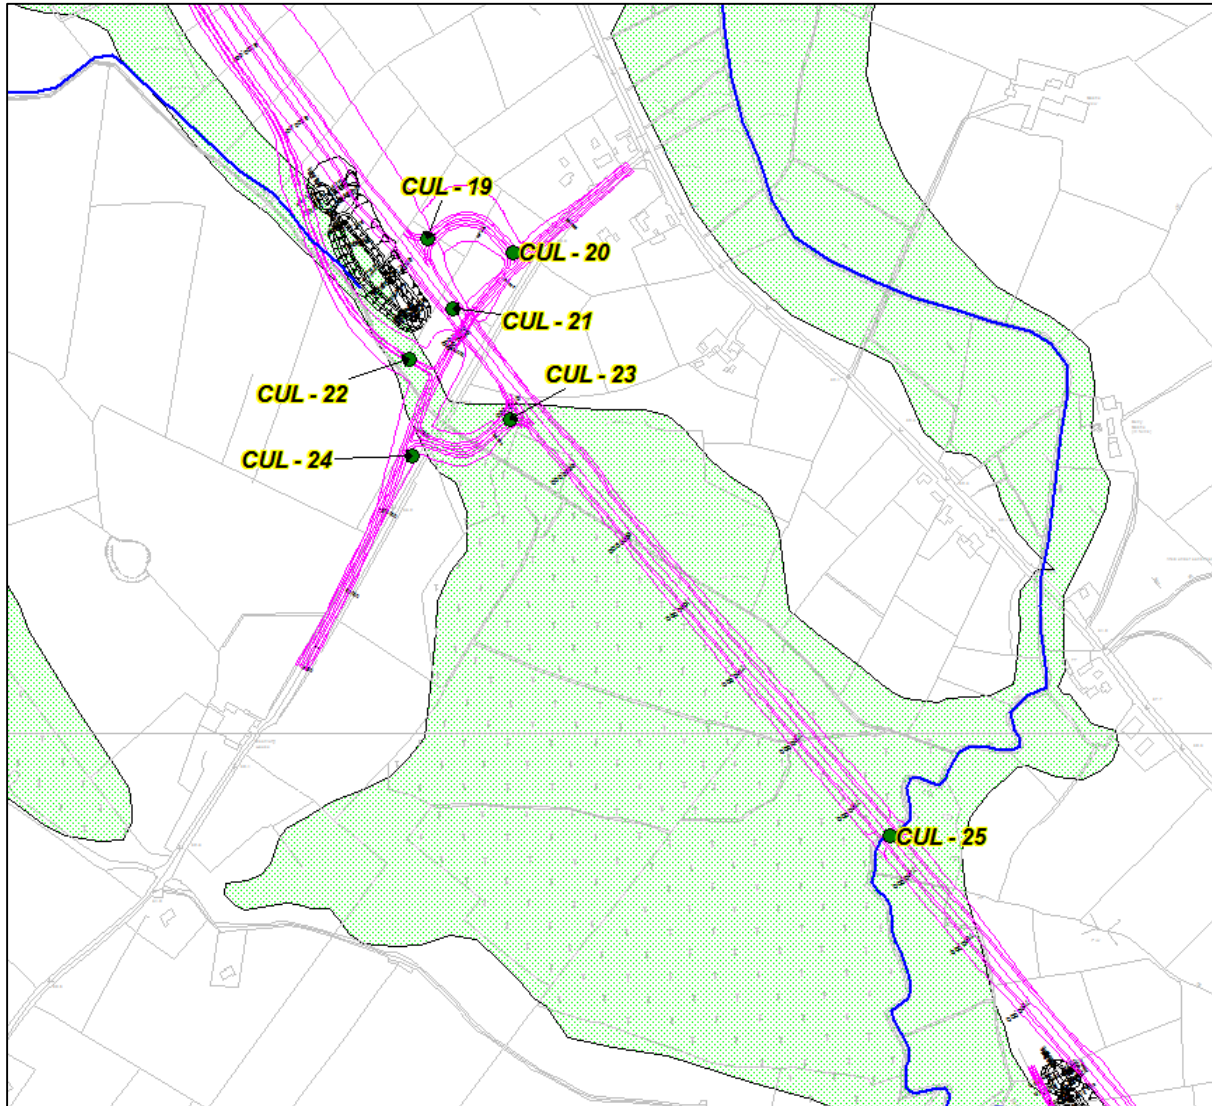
Watercourse Crossings and Arterial Drainage Benefitting Lands
